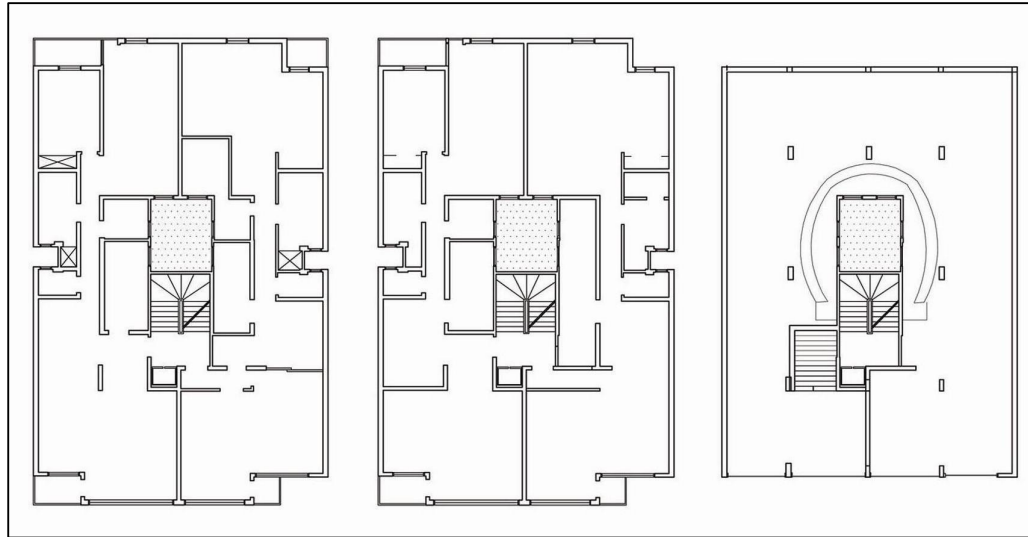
From right to left: ground floor plan, first floor plan and second floor plan. Five cafés are accommodated on these floors, and each one of the cafés uses modified plan schemas to different degrees.
